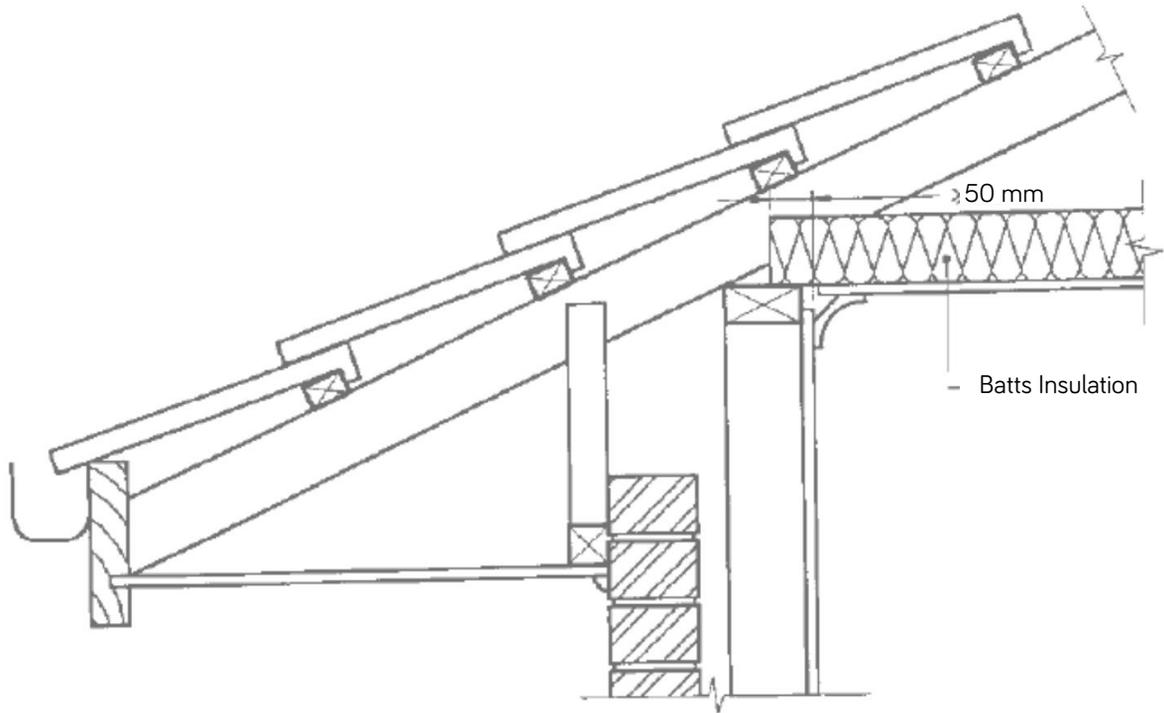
Extension of ceiling insulation beyond inside face of wall.
